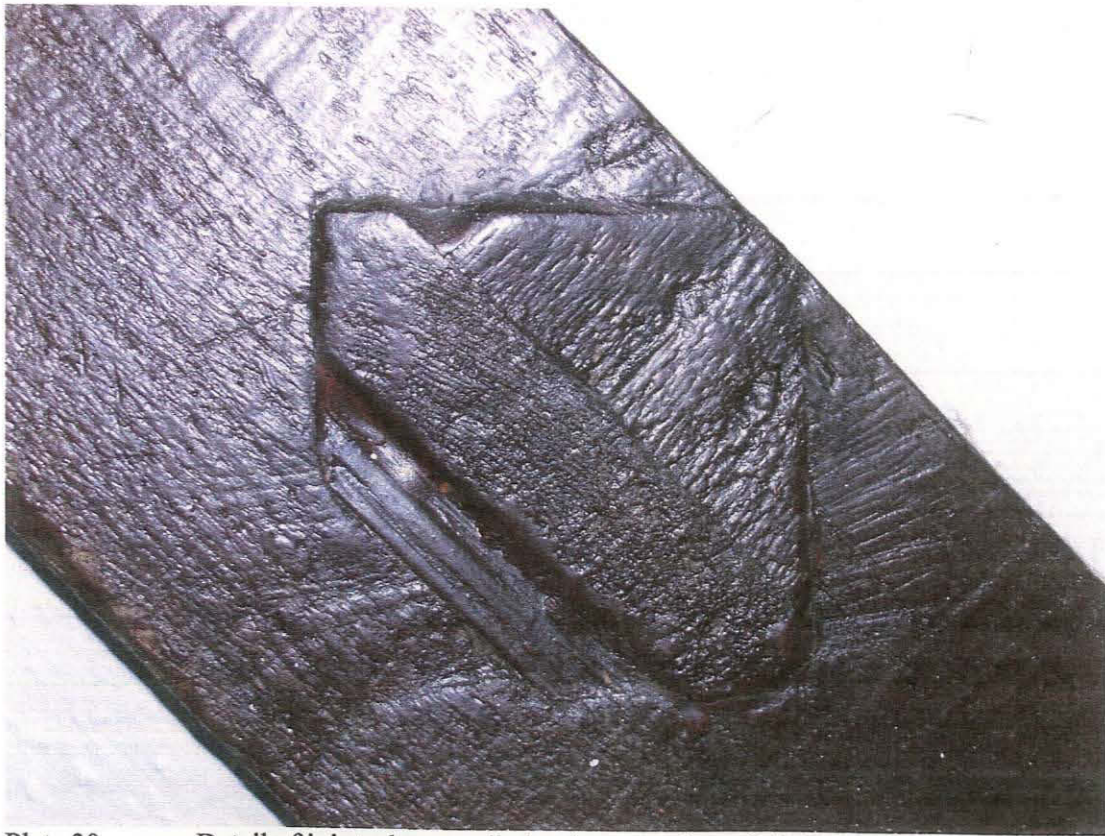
Detail of joint where purlin has been cut through in Room 64, taken from the south (173)
